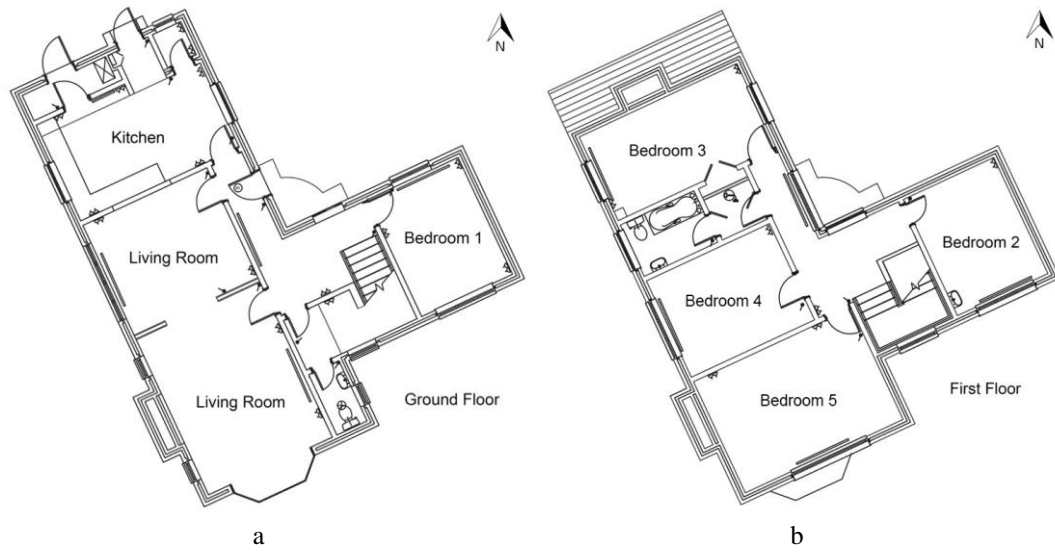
Tested building (a) Ground floor plan and (b) First floor plan
